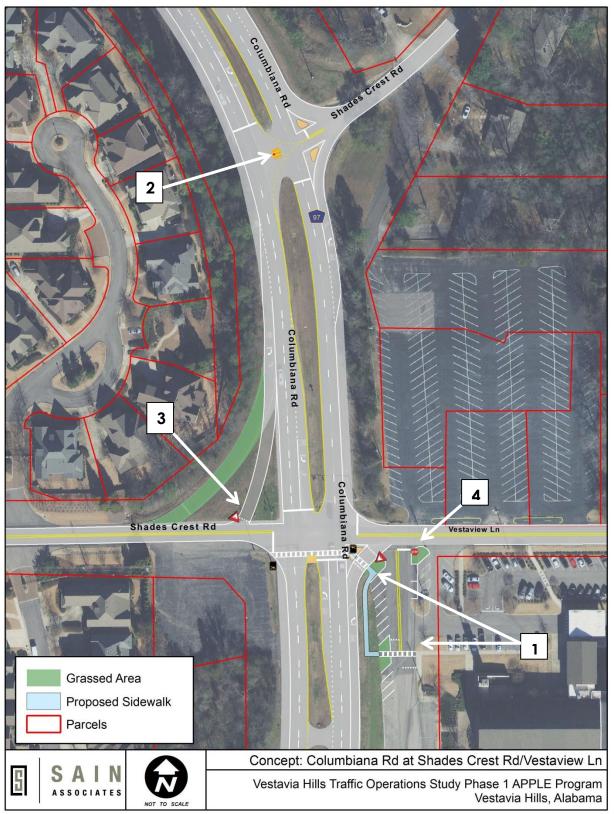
Columbiana Road at Shades Crest Road/Vestaview Lane Concept
